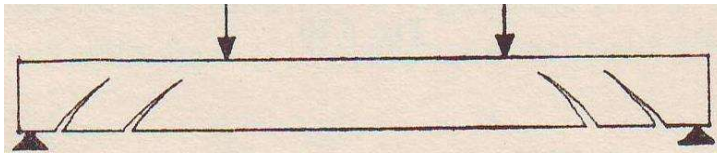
Cracks in concrete beams due to diagonal tension.
